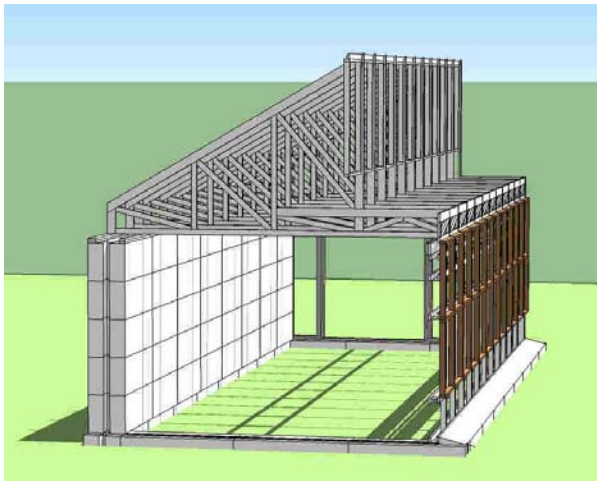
Foundation and north wall blocks. These will have 4 inches of Styrofoam Blue Board™ (R = 20) covered by Hardy board or equivalent on the outside.
